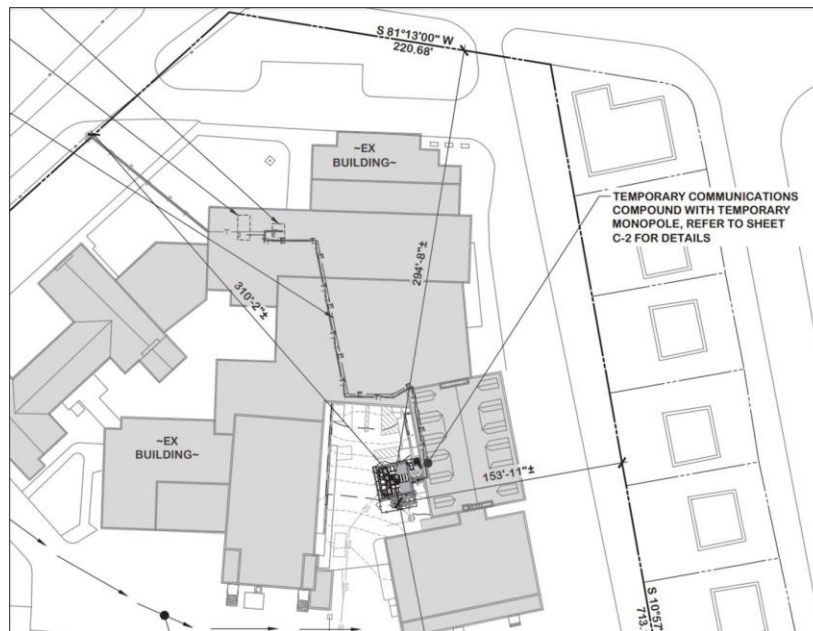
, p. 14, Figure 9: Site Plan with Proposed Temporary Telecommunications Tower Location
